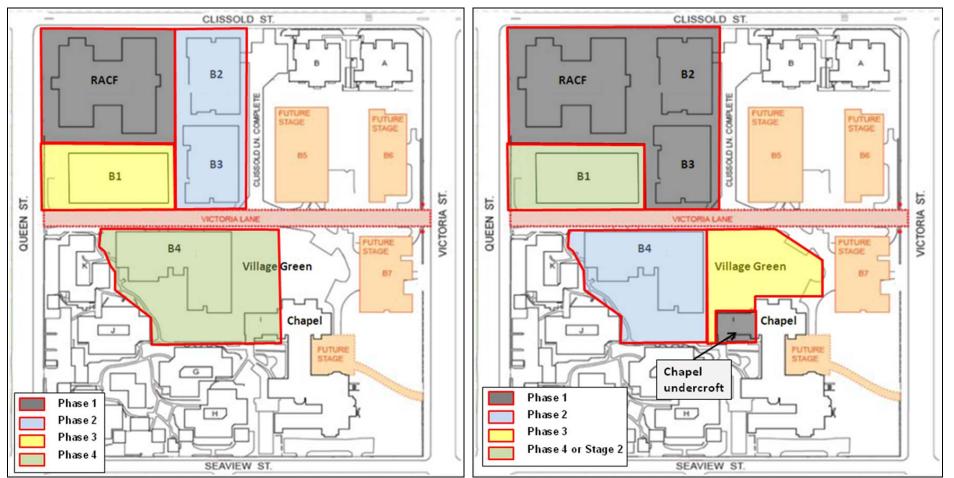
Approved (left) and proposed (right) indicative Building construction sequence plans (Base source: Proponent's EA)
